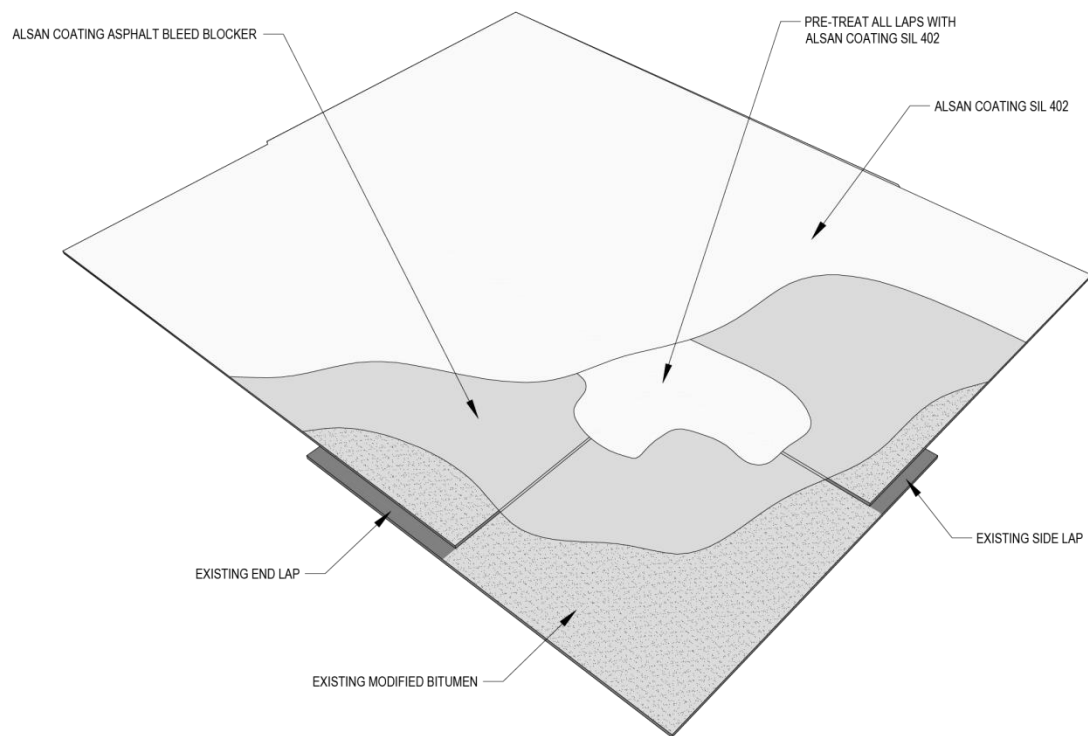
Silicone Roof Coating Over SBS Modified Bitumen, Side/End Laps
